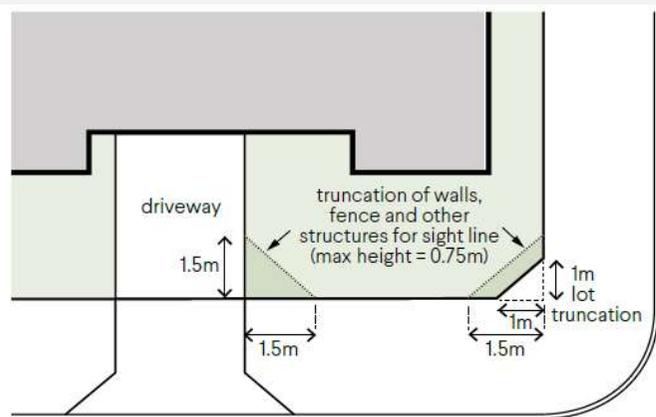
Truncation at street corner to provide sightlines (refer A3.8.7).
